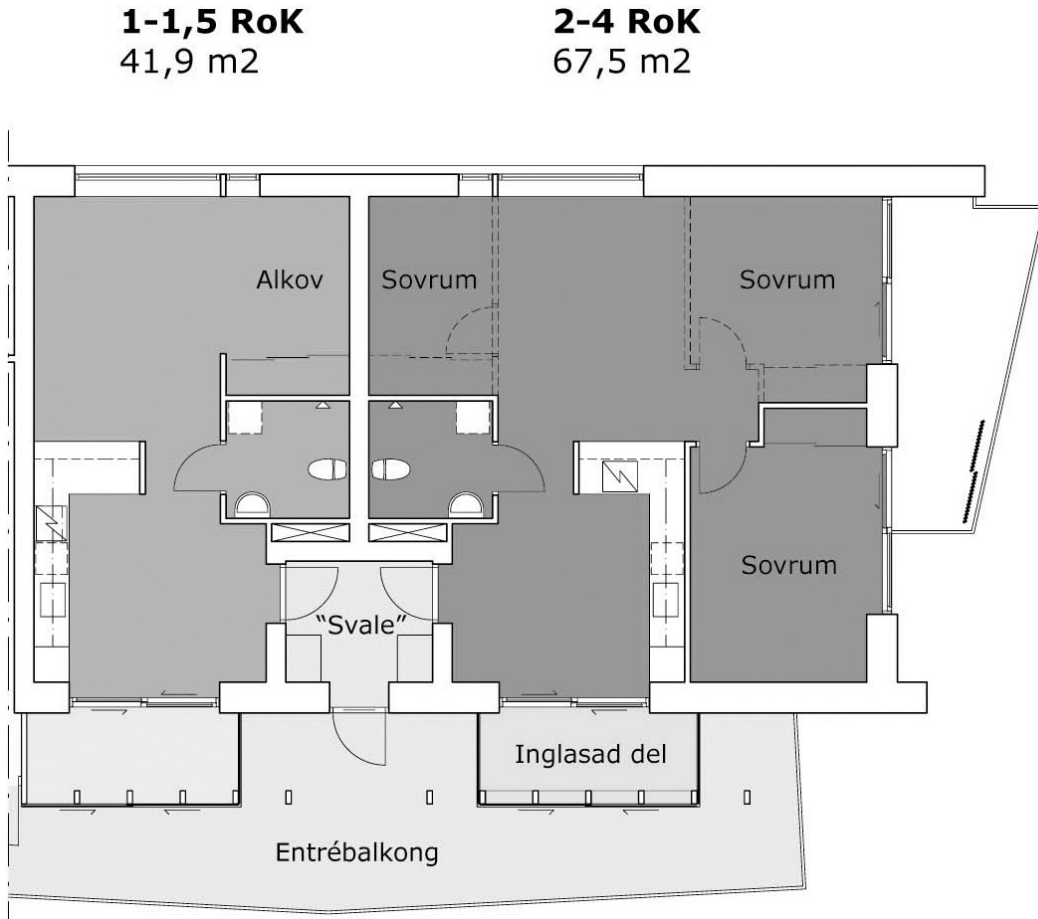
Flexible apartment plan with adjacent apartment; 2, 3 or 4 rooms alternatives indicated. Outlines from the design process and not as being built. Source: Malmström Edström Arkitekter.
